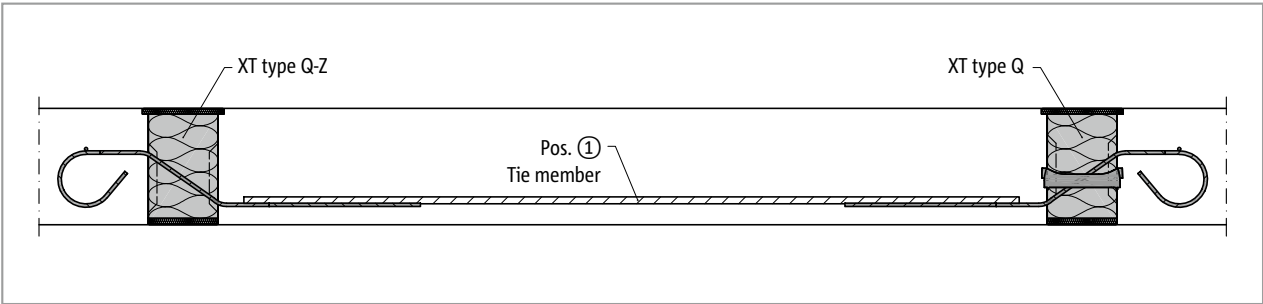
Schöck Isokorb® XT type Q-Z-V1 to Q-Z-V4, Q-V1 to Q-V4: Section A-A; reinforced concrete slab tensioned in a single axis
